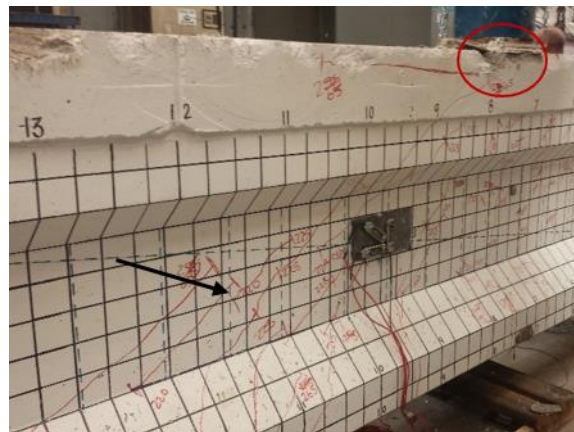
Cracking and failure pattern from test A1; shear cracking marked by black arrow, crushing in deck marked by red circle
